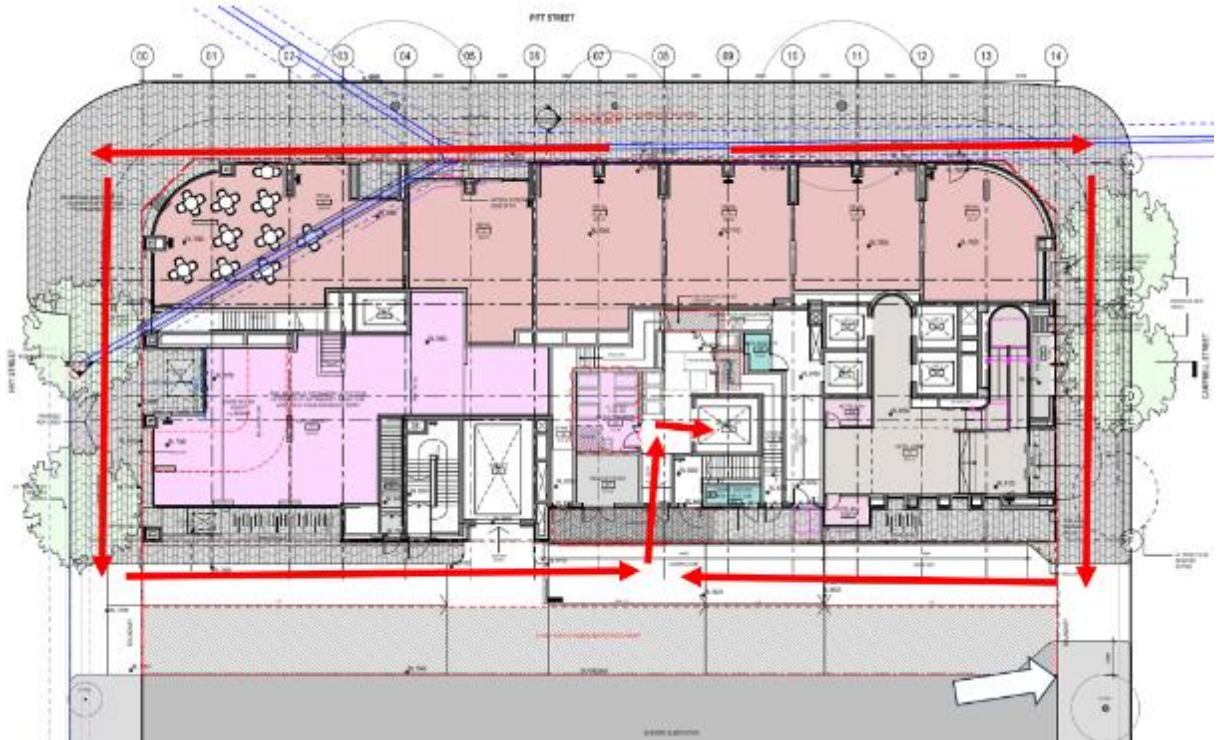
Proposed ground floor plan showing the path of travel in red for the waste bins to reach the goods lift from the retail tenancies
